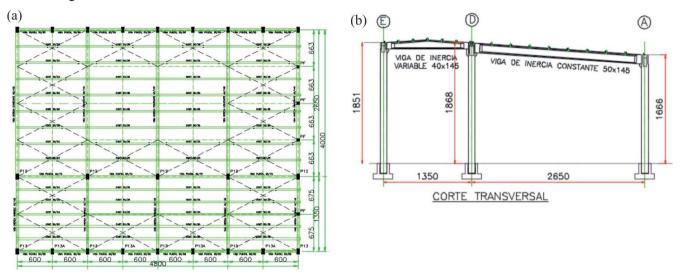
Diagrams in a) plan and b) elevation of the project (dimensions in cm).
